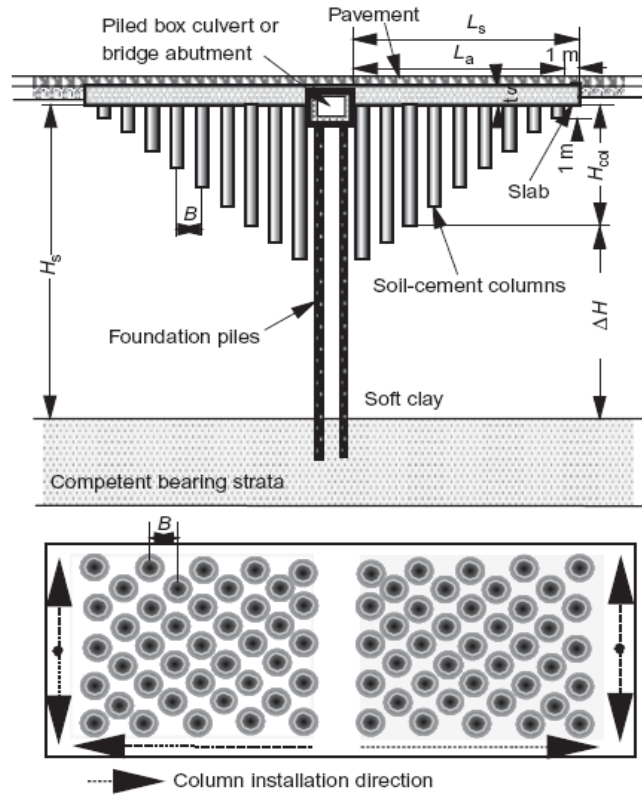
Section and Plan View of Soil-Cement Pile Supported Approach Embankment (Shen et al., 2007).
